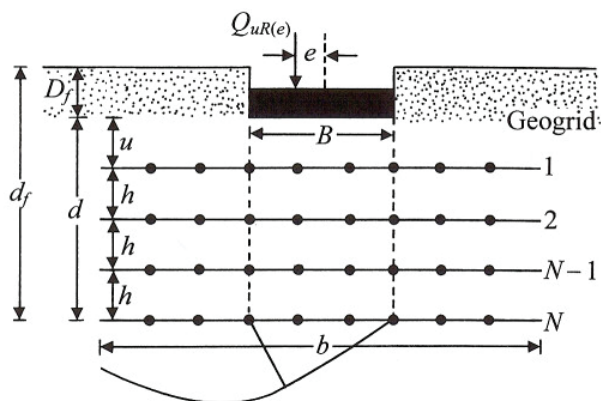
Assumed failure mode under an eccentrically loaded strip foundation on geogrid-reinforced sand
